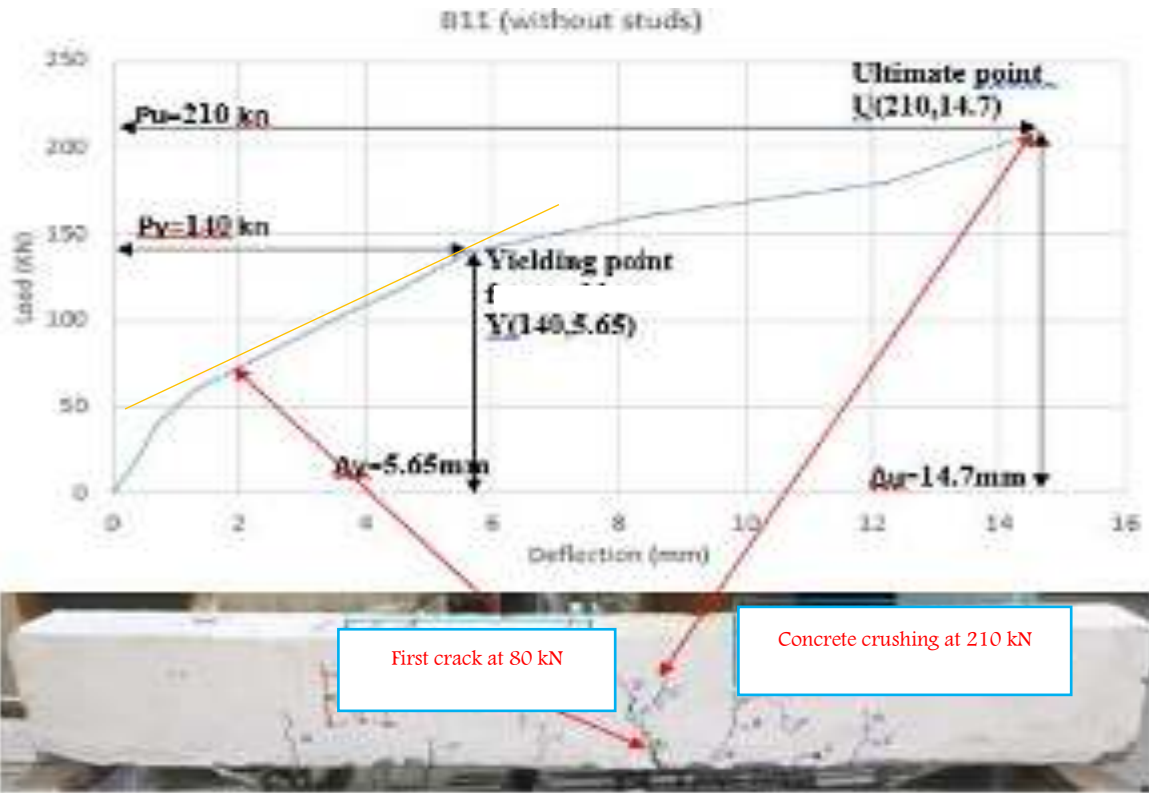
Load-deflection and crack patterns of composite hollow beam B11.
